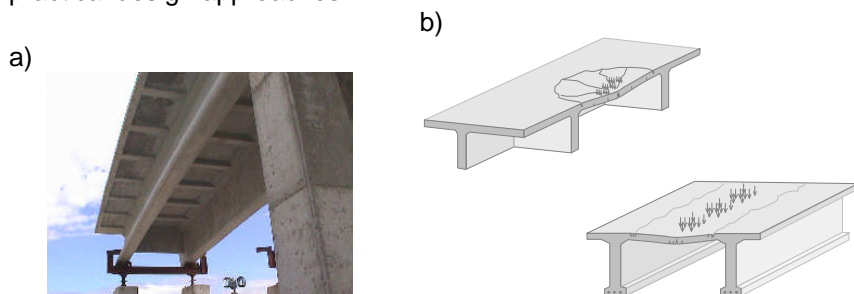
Thin UHPFRC slabs: a) deck of Seonyu footbridge (with 3 cm thick slabs<sup>5</sup>); b) local bending failure modes<sup>7</sup>
